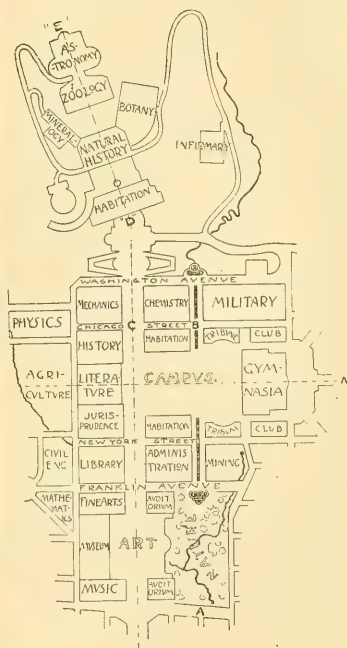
General plan and skeleton plan of buildings for the University of California.
